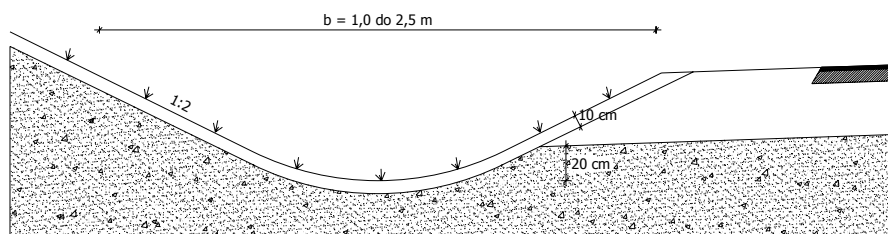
Grassed curved road ditch for a longitudinal fall of  $J = 1 \%$  to  $3 \%$
